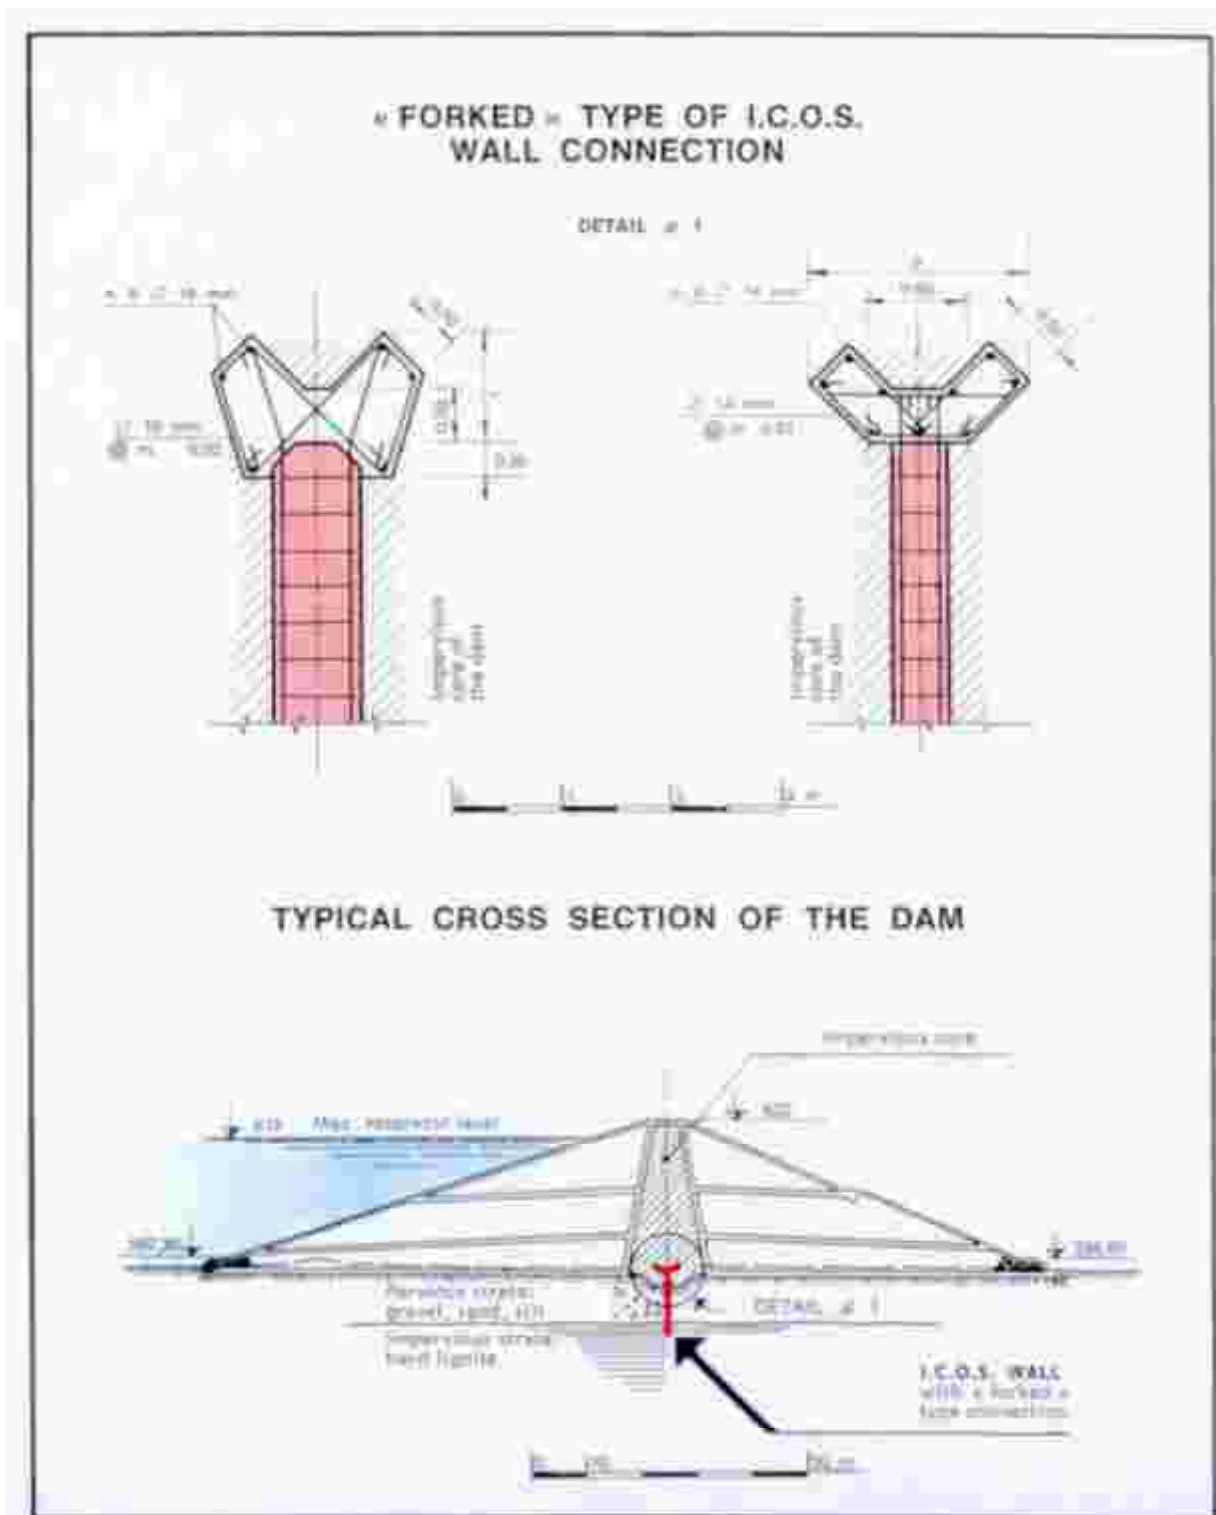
Perdika Dam, Greece: Connection pile cutoff wall with central impervious core
